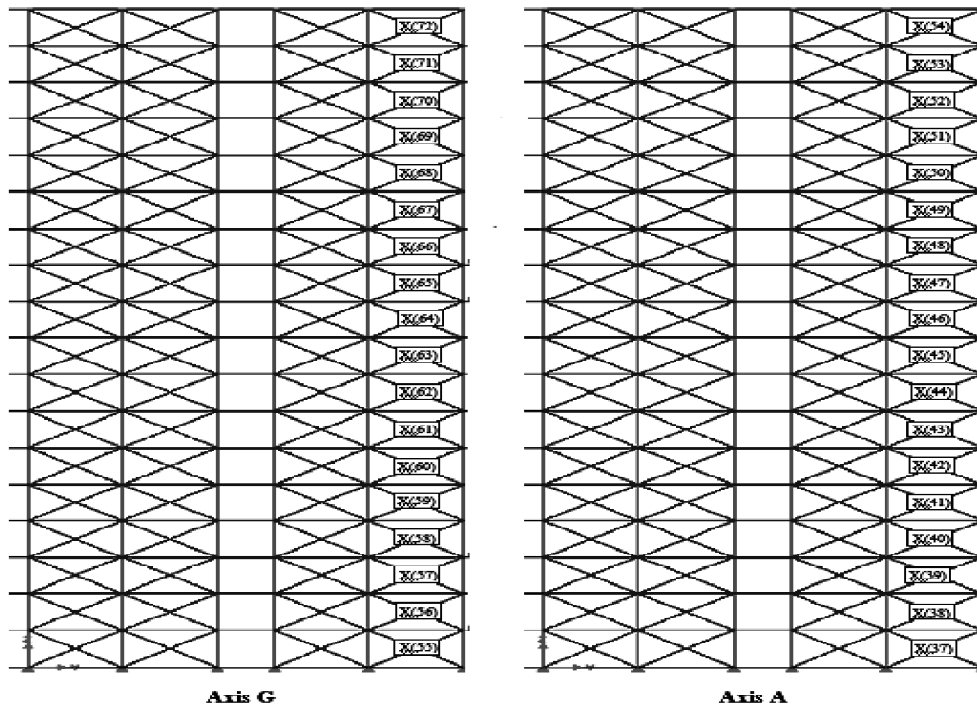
Braced frames of the 18-story building and the places (X(i)) over which the dampers can be installed.
